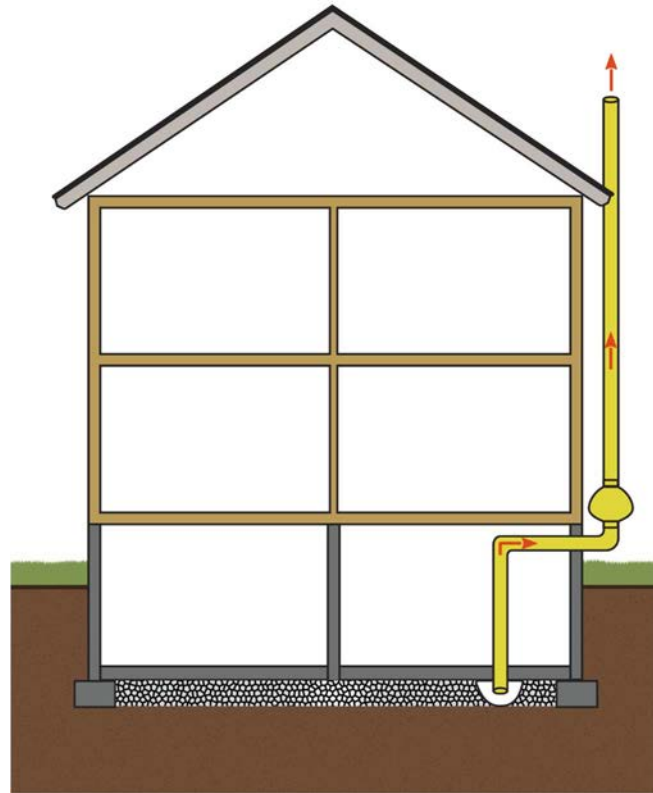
Sub-slab depressurization with fan external to building and roof level exhaust from basement.
